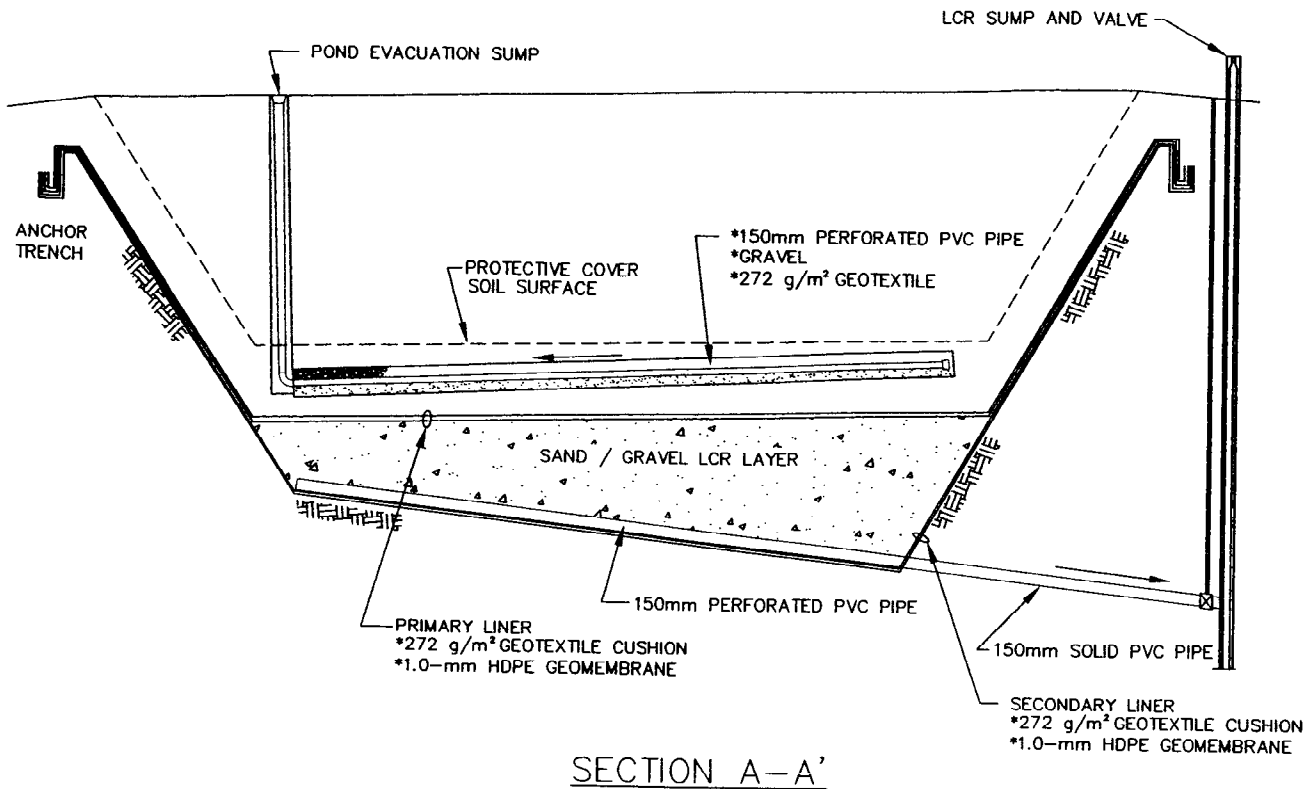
Typical Septage Pond North-South Cross-Section A-A'
